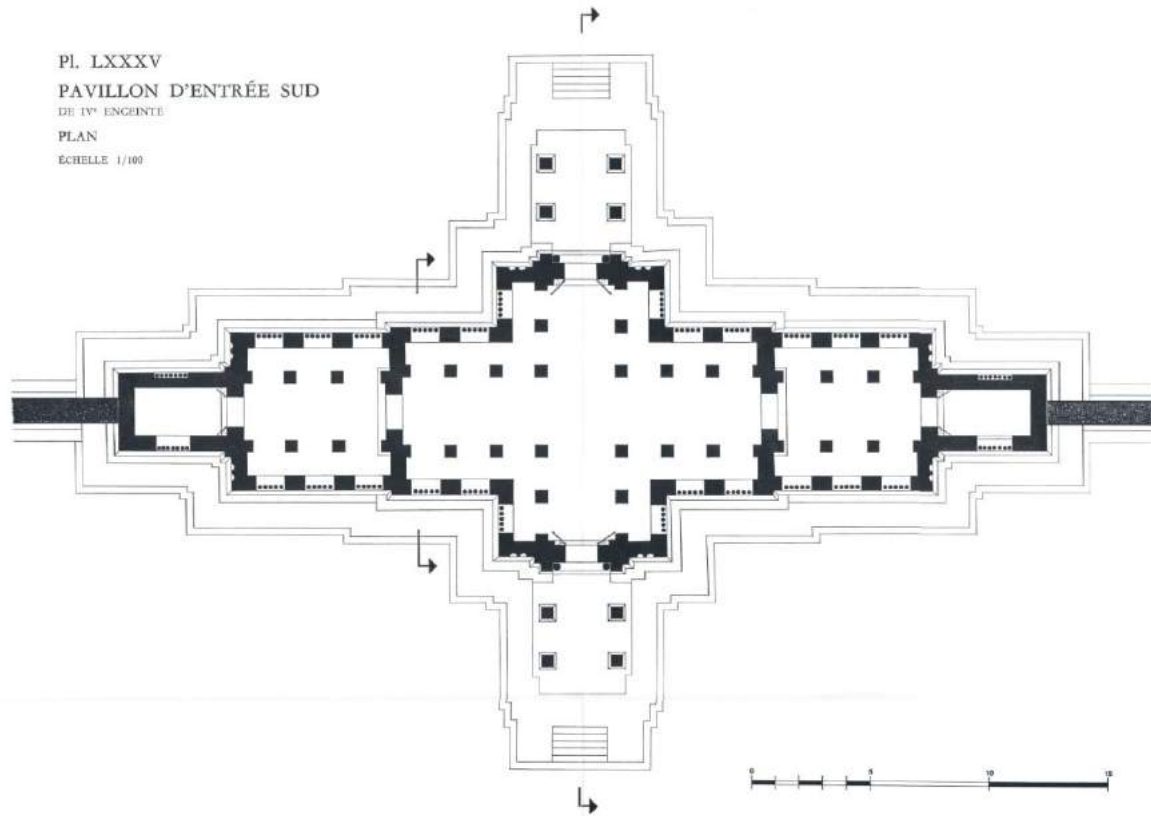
Floor plan of the South gopura of the fourth enclosure (Nafilyan 1969: Plate LXXXV)
